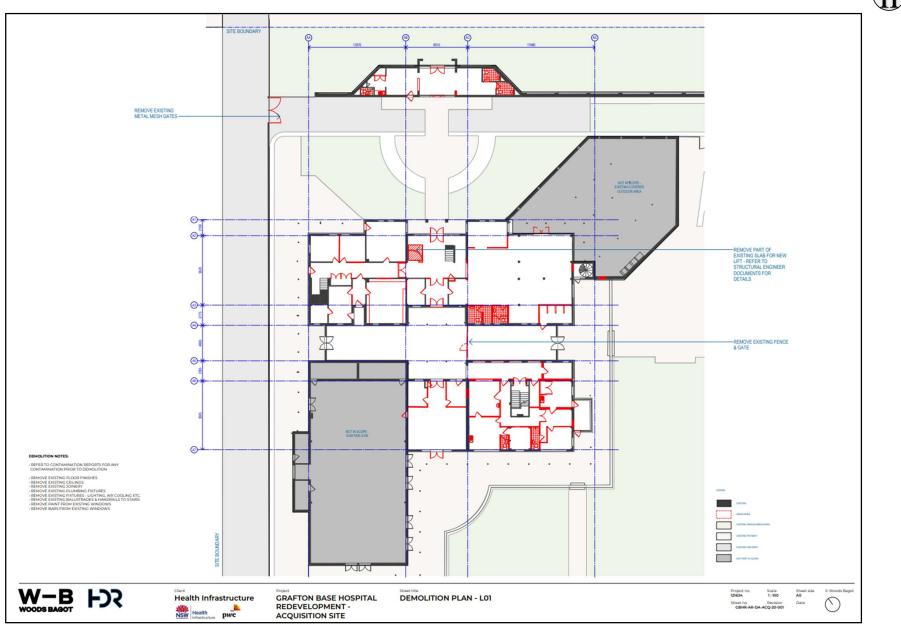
Grafton Correctional Centre Acquisition Site- Proposed demolition plan level 1
